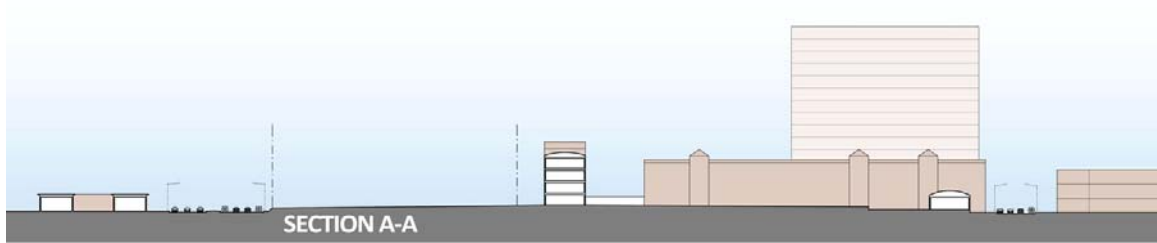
Site A; Section A-A through MICA Commons Dormitory, Site A, and West North Avenue
